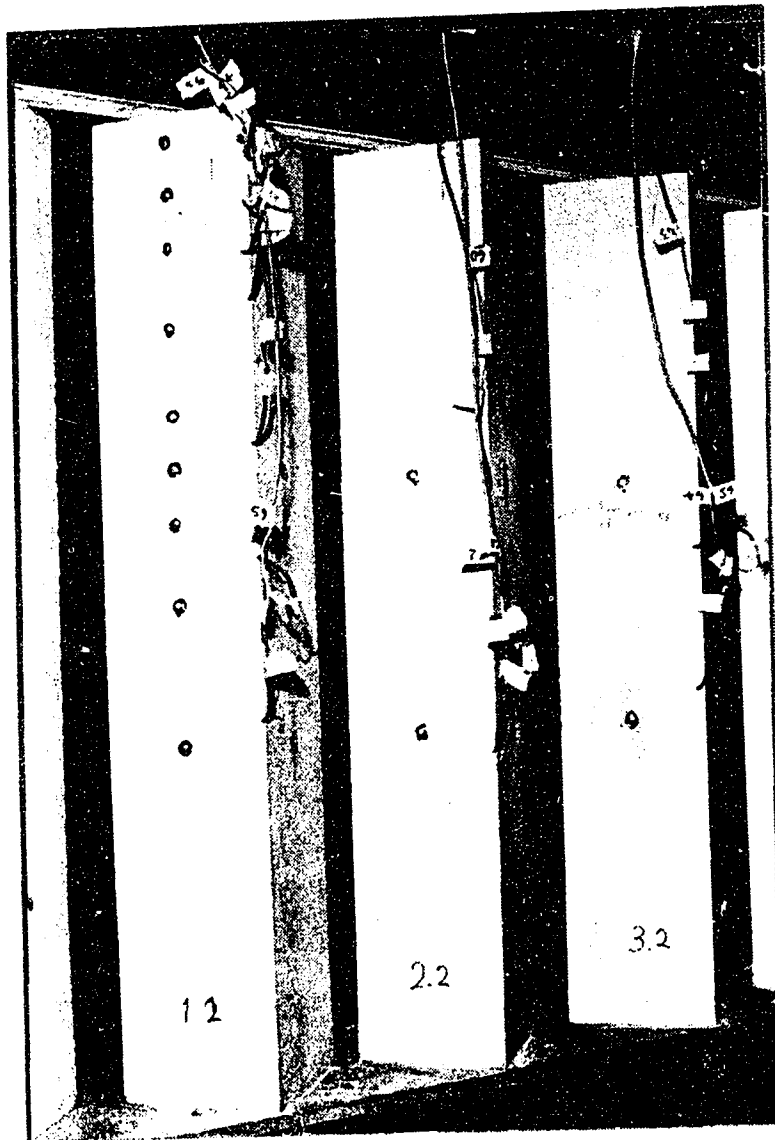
A Group of Three Reinforced Concrete Specimens
